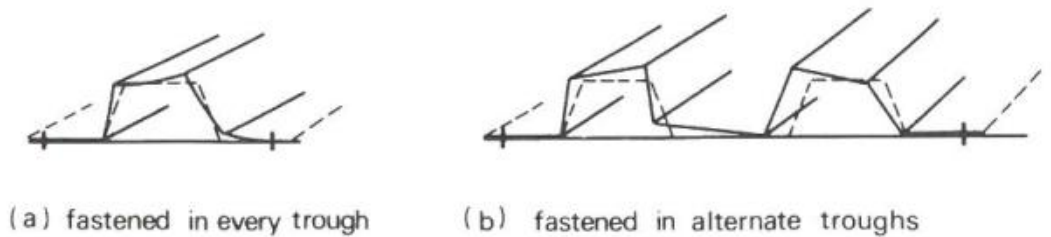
Profiles distortion with alternative fastener arrangements (a) fastened in every trough (b) fastened in alternate troughs. (J.M. Davies and E.R. Bryan, 1982, P.35)
